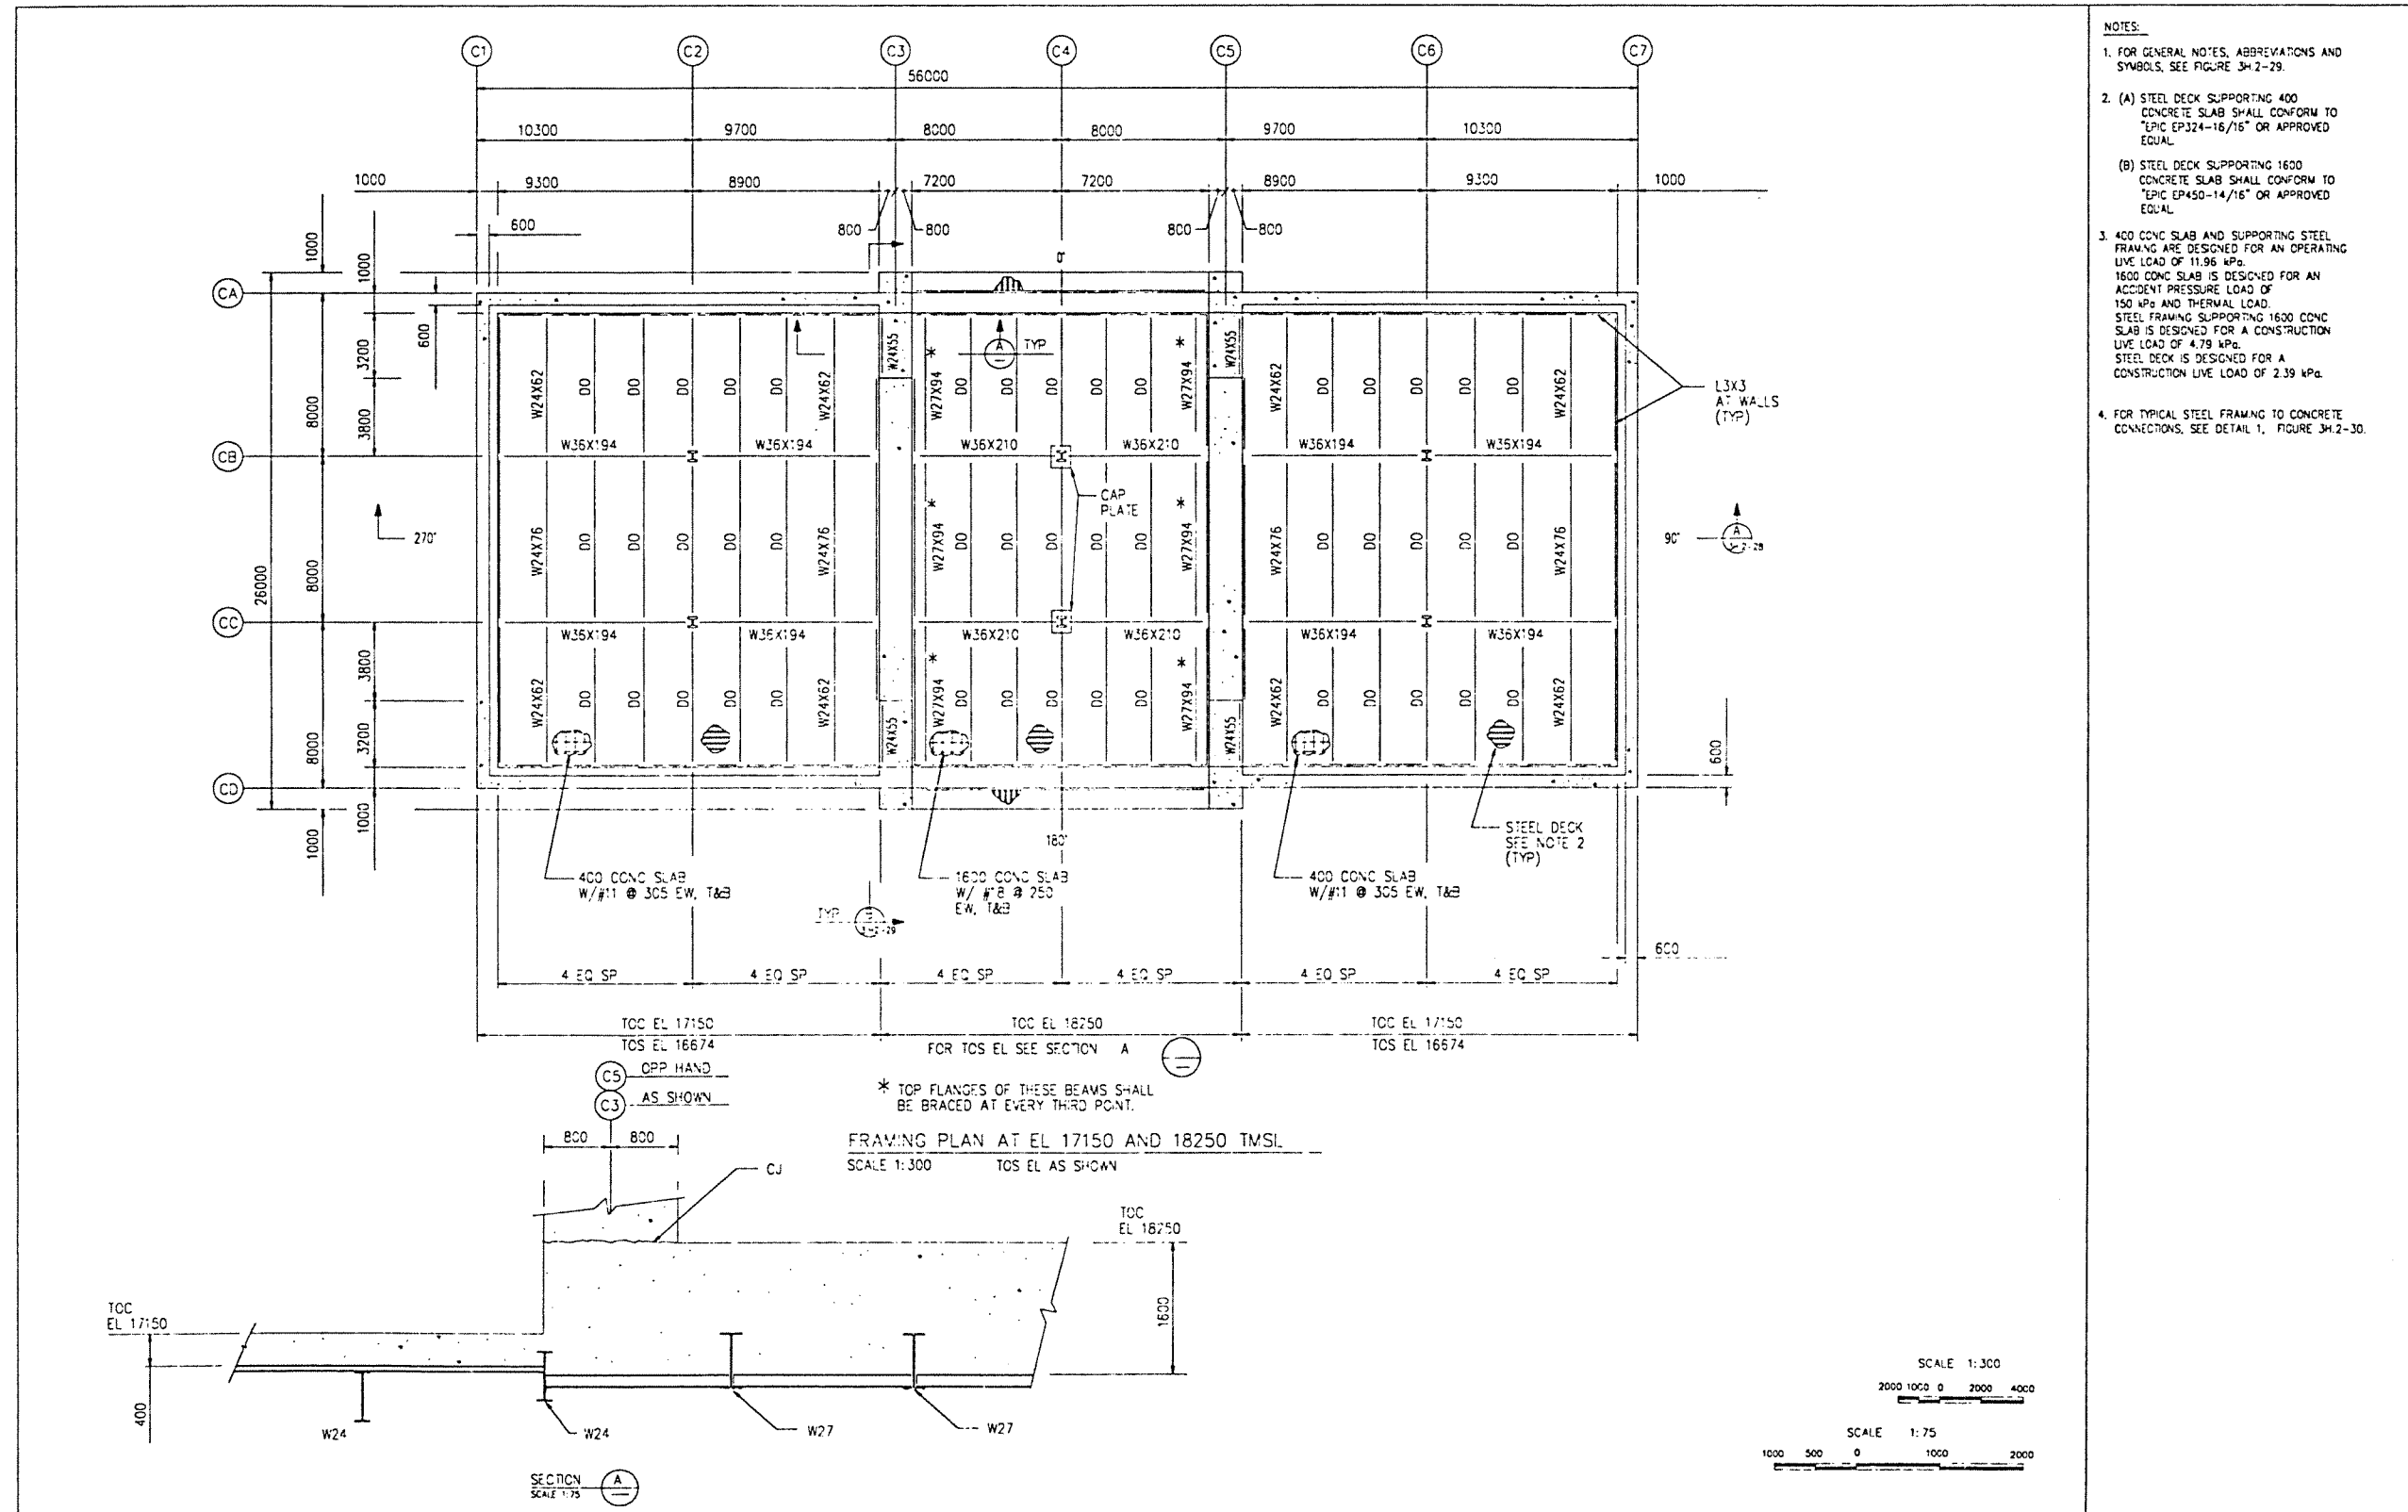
H.2-25 CONTROL BUILDING-FRAMING PLAN AT ELEVATION TMSL 17150 AND 18250 mm
